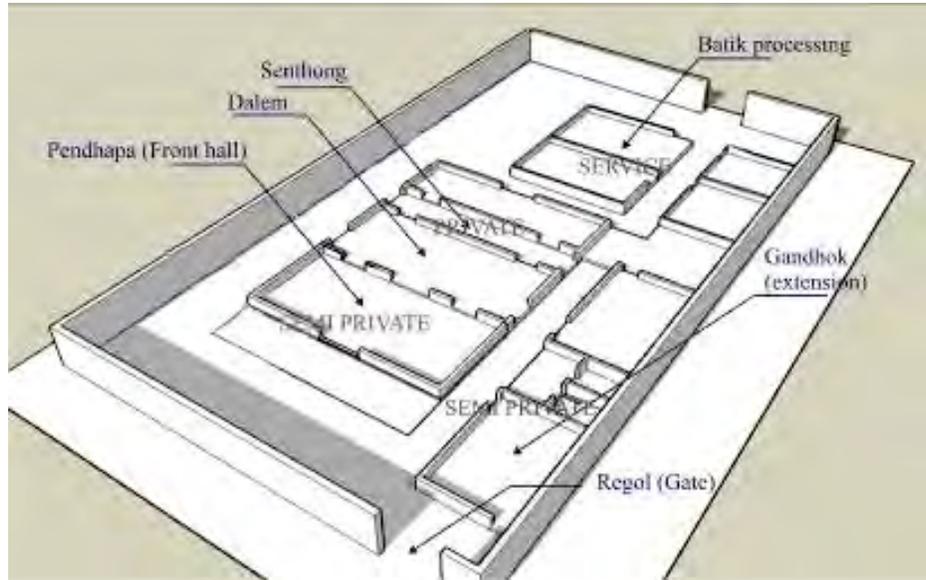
Sample [A] of the Javanese house: Original plan.
